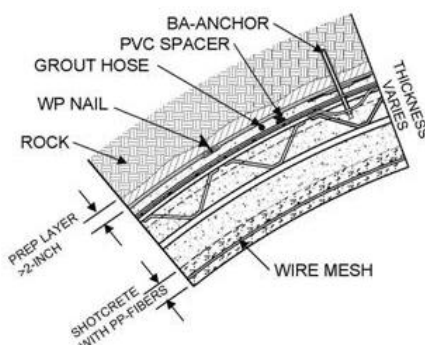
Typical shotcrete final lining detail (sourced from [80])
